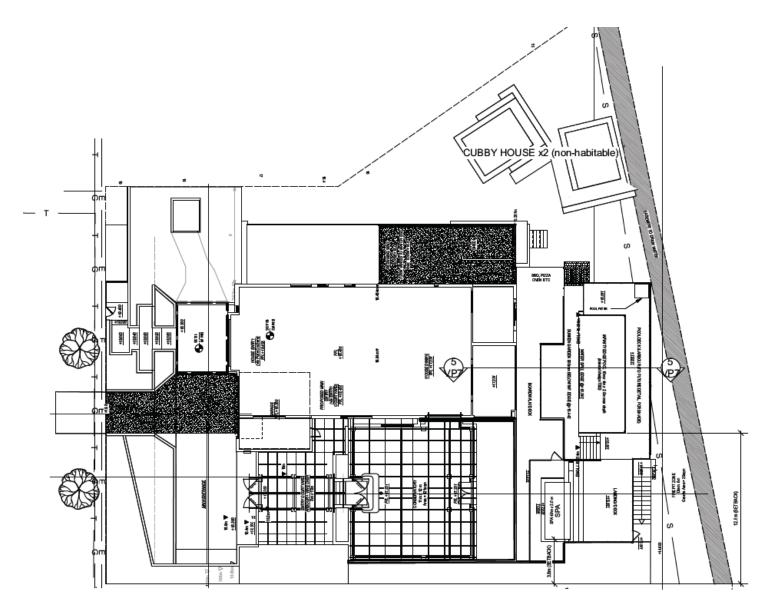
Ancillary structures connected to and surrounding main dwelling (Dirty Girl Designs, 2021)
